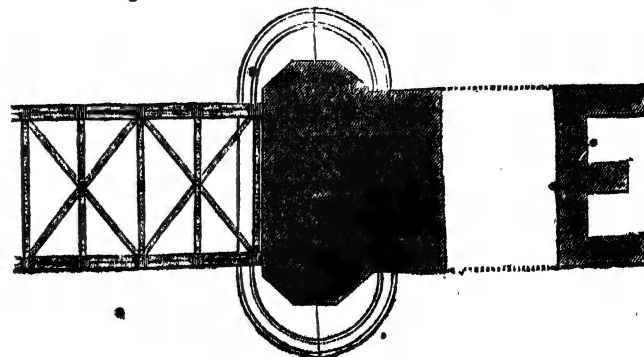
Plan of Abutment and Timbers of the Bridge.
